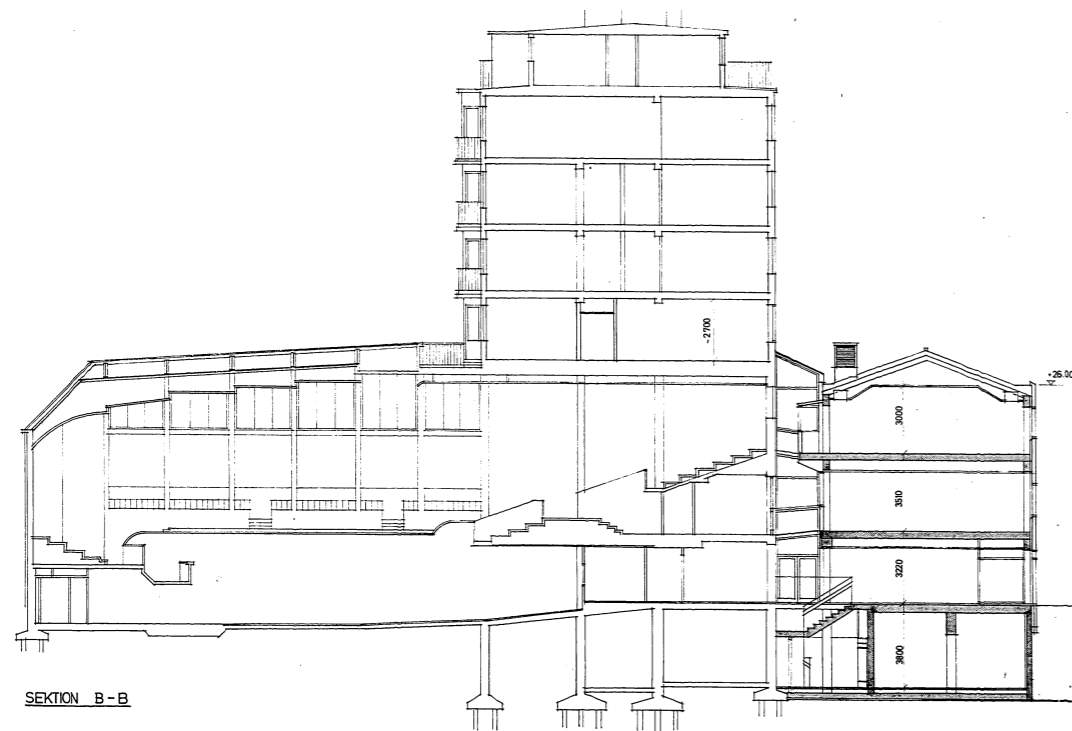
North-south section. Original drawing (1981) (Göteborgs Stad., n.d.)
